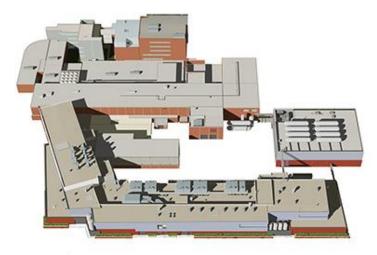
An architectural rendering shows the baselined conventional facilities design of the Facility for Rare Isotope Beams.
